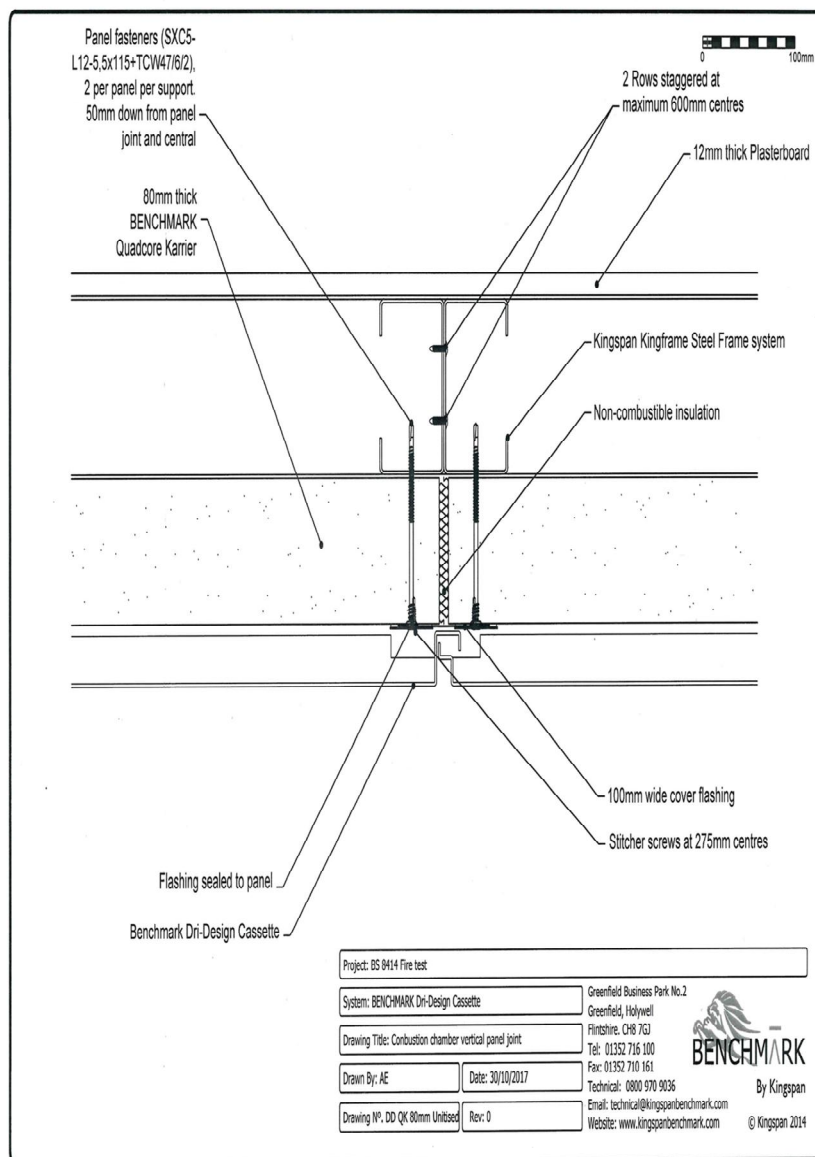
Client supplied drawing – Combustion chamber vertical panel joint.
